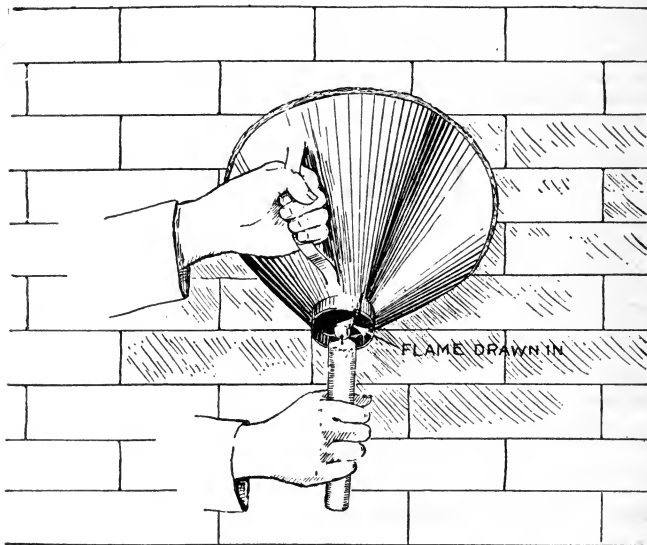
,144.—Air leak detector cone, and method of using it. The cone is easily made from sheet metal. The large end should be flanged and the flange faced with a soft felt gasket to prevent air leaking in past the flange when pressed against the back setting. The seam should be soldered, thus making it air tight. Now, when the boiler is in operation, by pressing the cone up against the setting and holding a candle in front of the small hole, any air leak in the brick wall will be indicated by the inrushing air drawing the flame into the cone. Evidently with the small hole at the end of the cone, the effect is magnified by the increased velocity of the air at that point. The hole should not be more than, say, 1 inch in diameter. With such arrangement very minute leaks may be detected.
